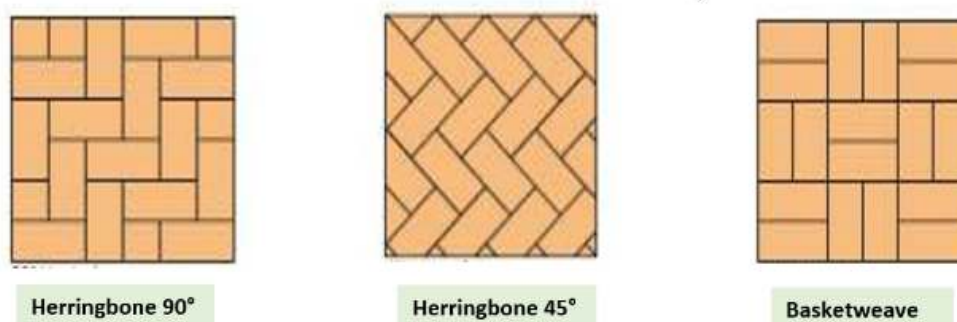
Horizontal and Vertical Pavement Pattern Model Installation
